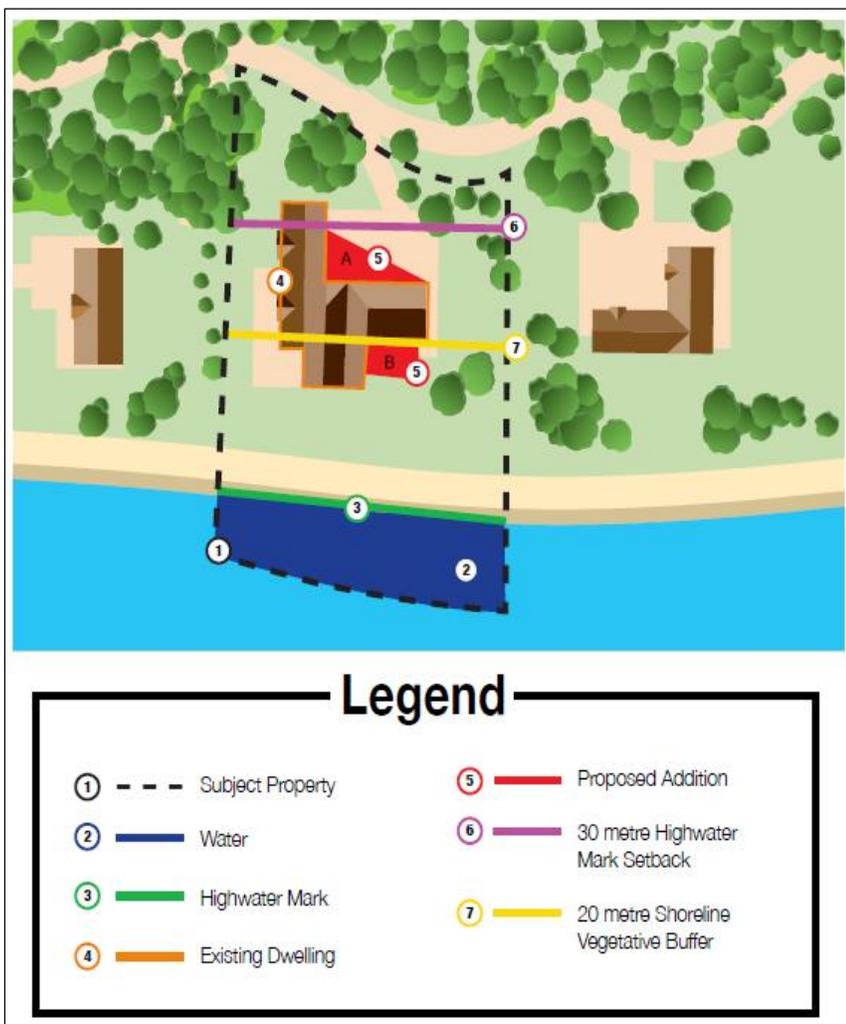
Two additions (A and B) to a legal existing dwelling with shoreline on a lake
